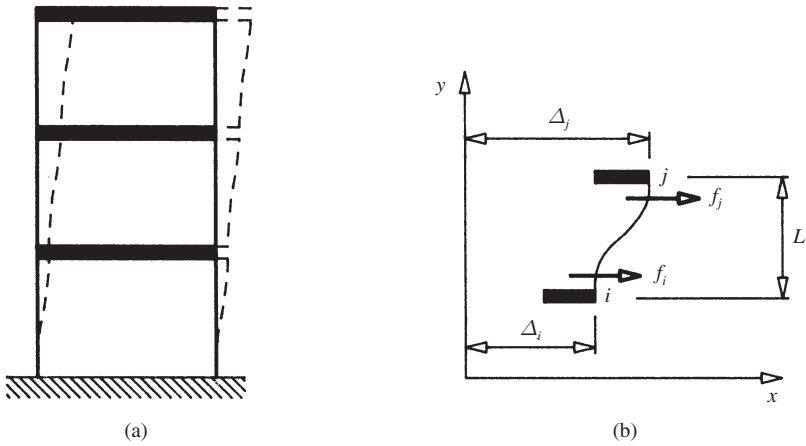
(a) General sway frame. (b) Column element under sway
